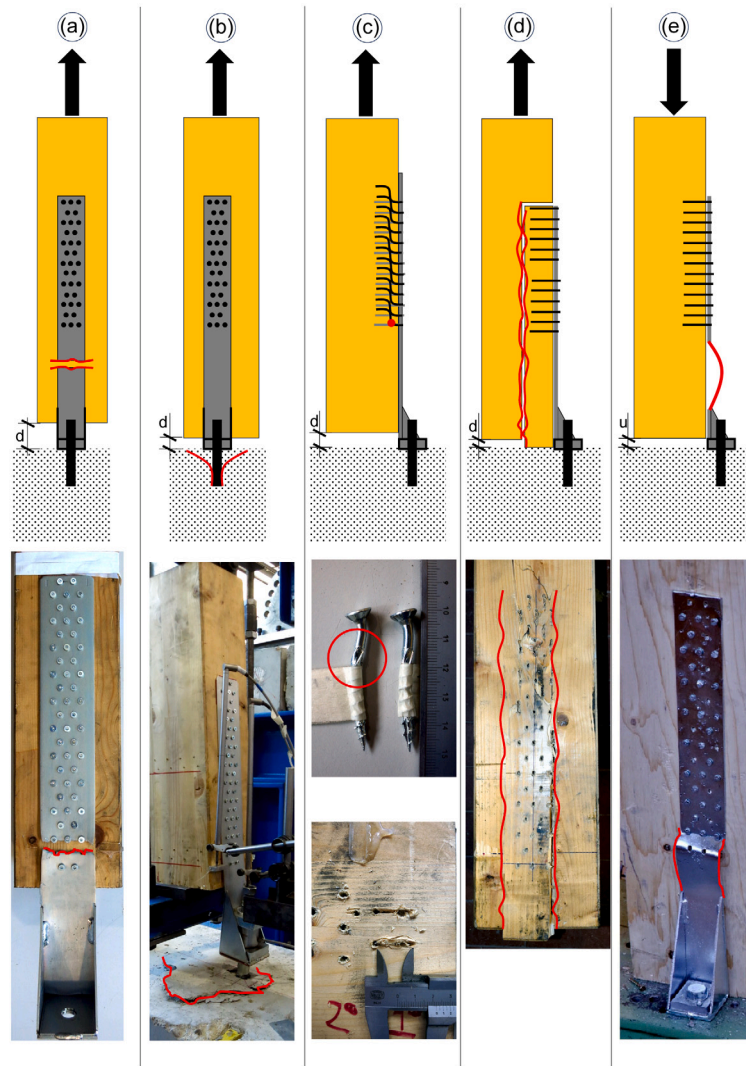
Typical failure modes for hold-down connection: (a) steel break-out in tension; (b) anchorage's failure; (c) plastic hinge of screws combined to embedment of timber; (d) plug-shear; (e) buckling of steel flange. (Notes. Photographic evidences (a)-to-(d) were partly adapted either from [39] or unpublished material available to the Authors. Photo (e) was adapted from [22], courtesy of Massimo Fragiaco. The Reader is referred to the color version of this figure.)
